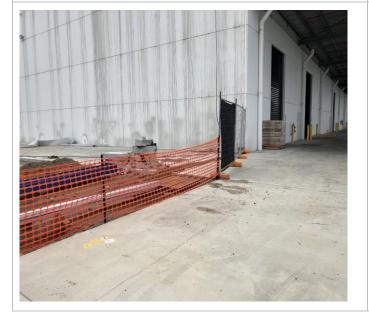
Demarcation of Stage 2 construction works from operating Stage 1 warehouse
